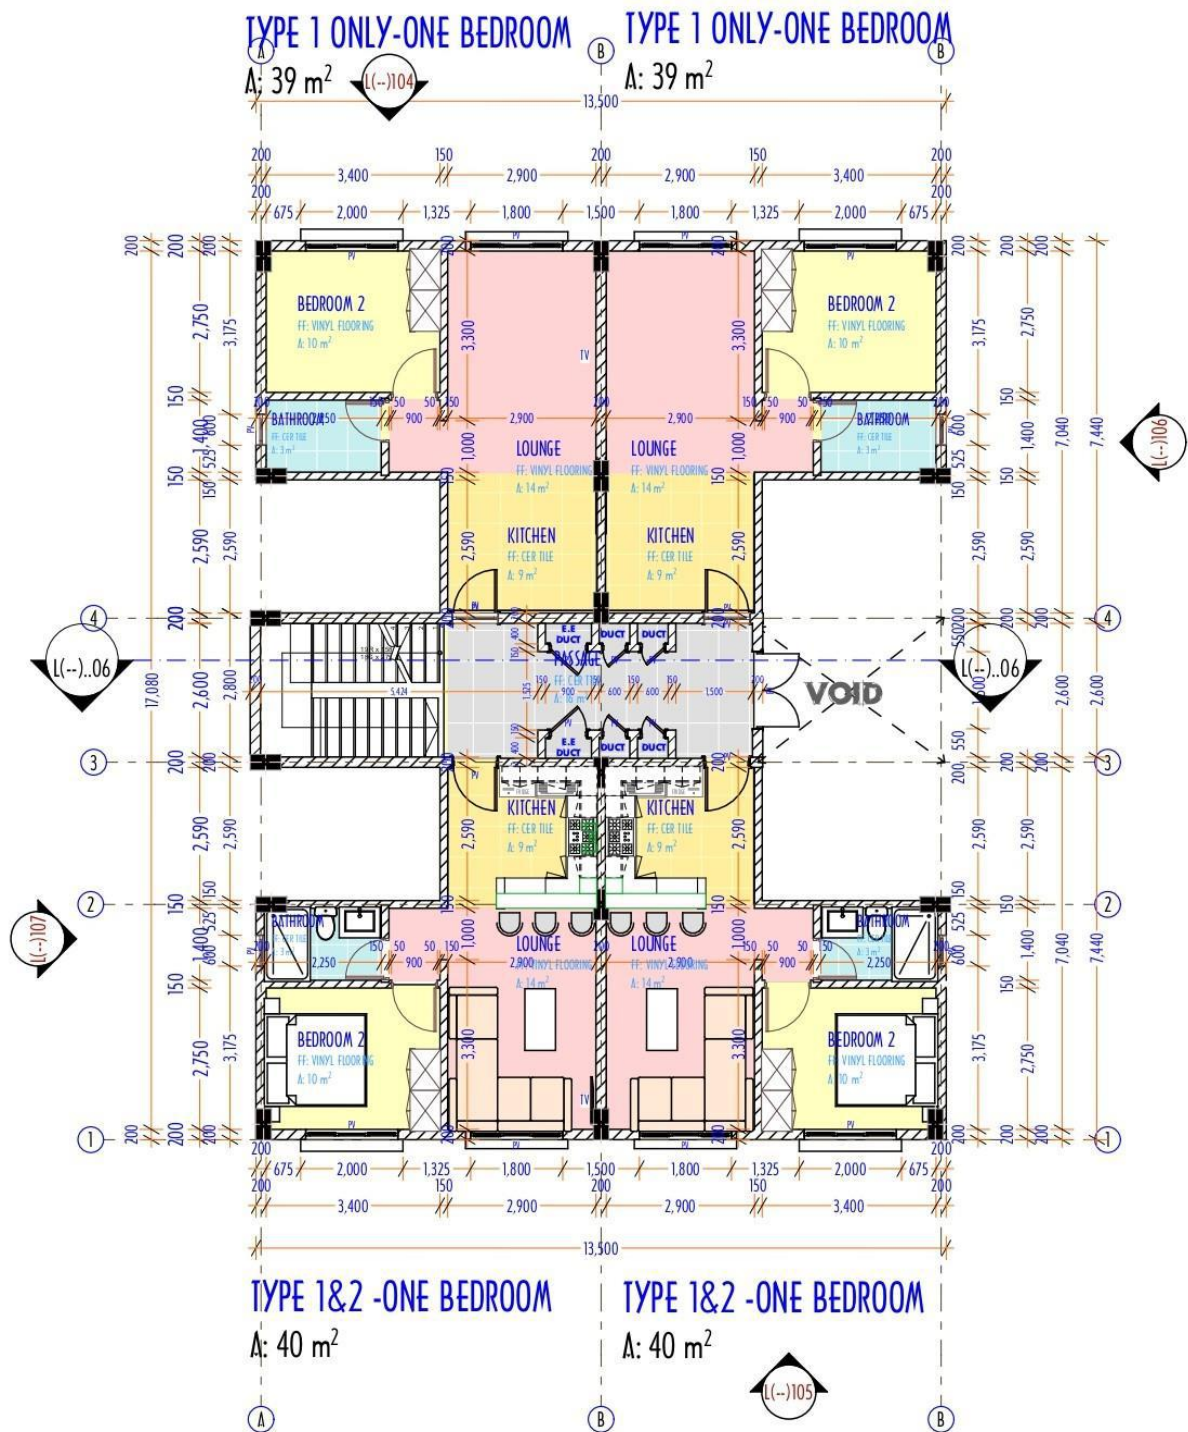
Floor Plan Layout for a 1 Bedroom Housing Unit
